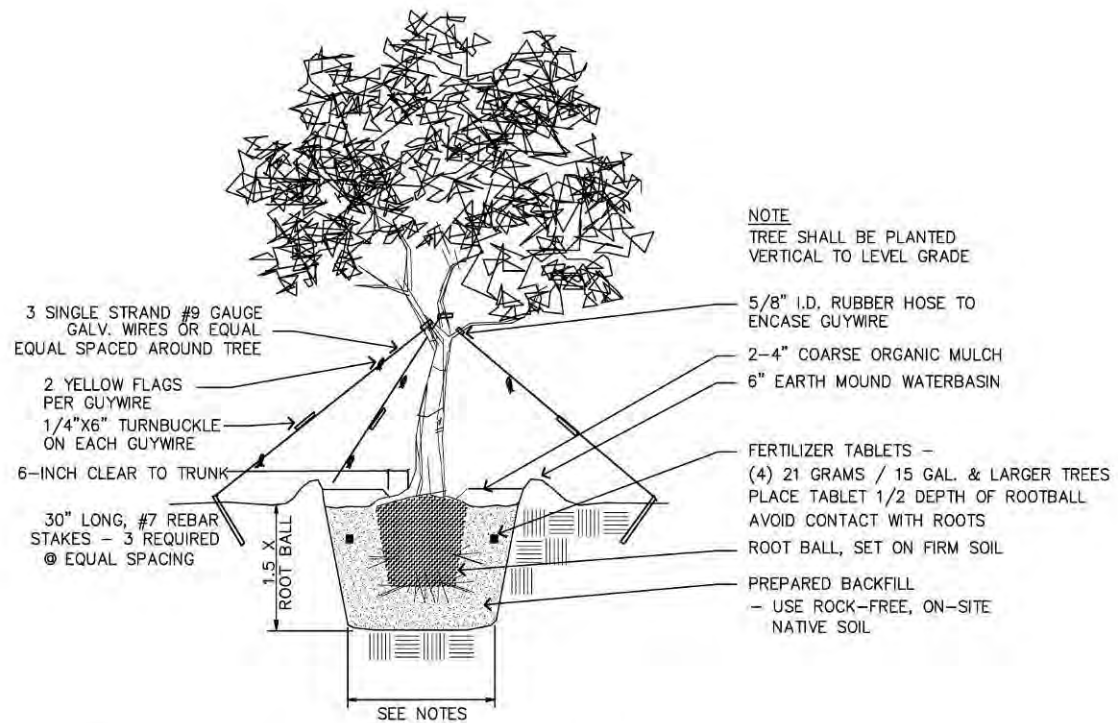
TREE PLANTING DETAIL WITH GUYING
